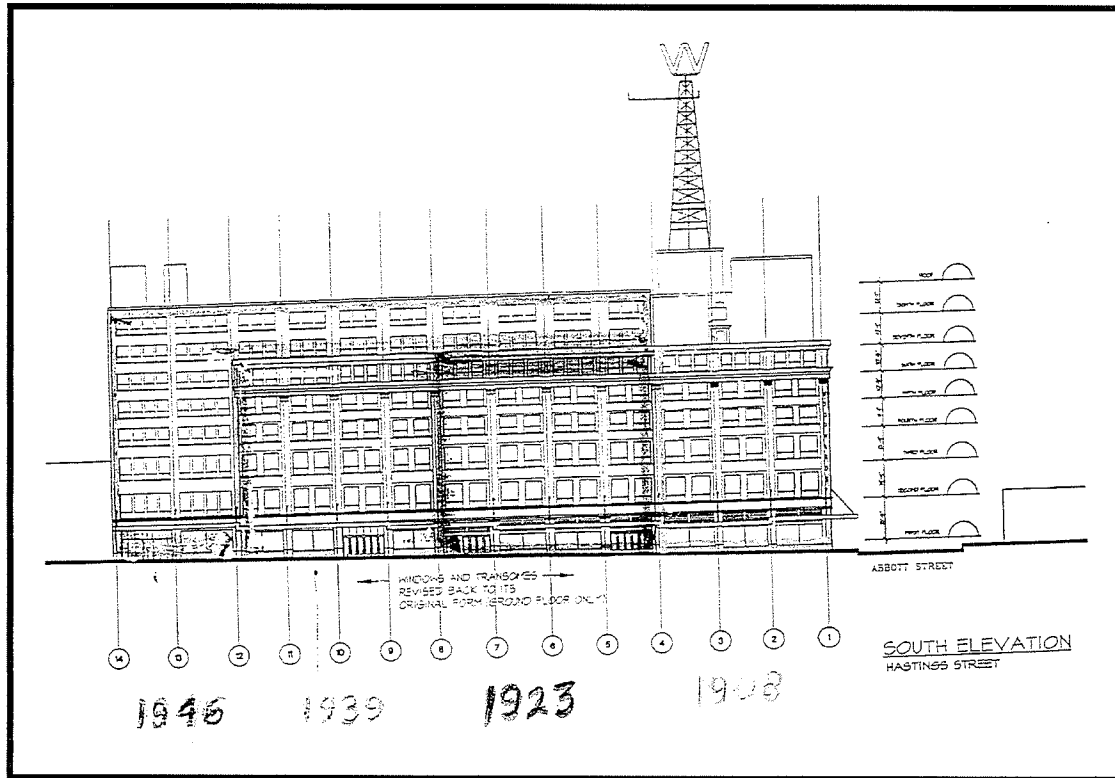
Elevation of Woodward Building compliments of Davidson, Yuen, and Simpson, 2001.
